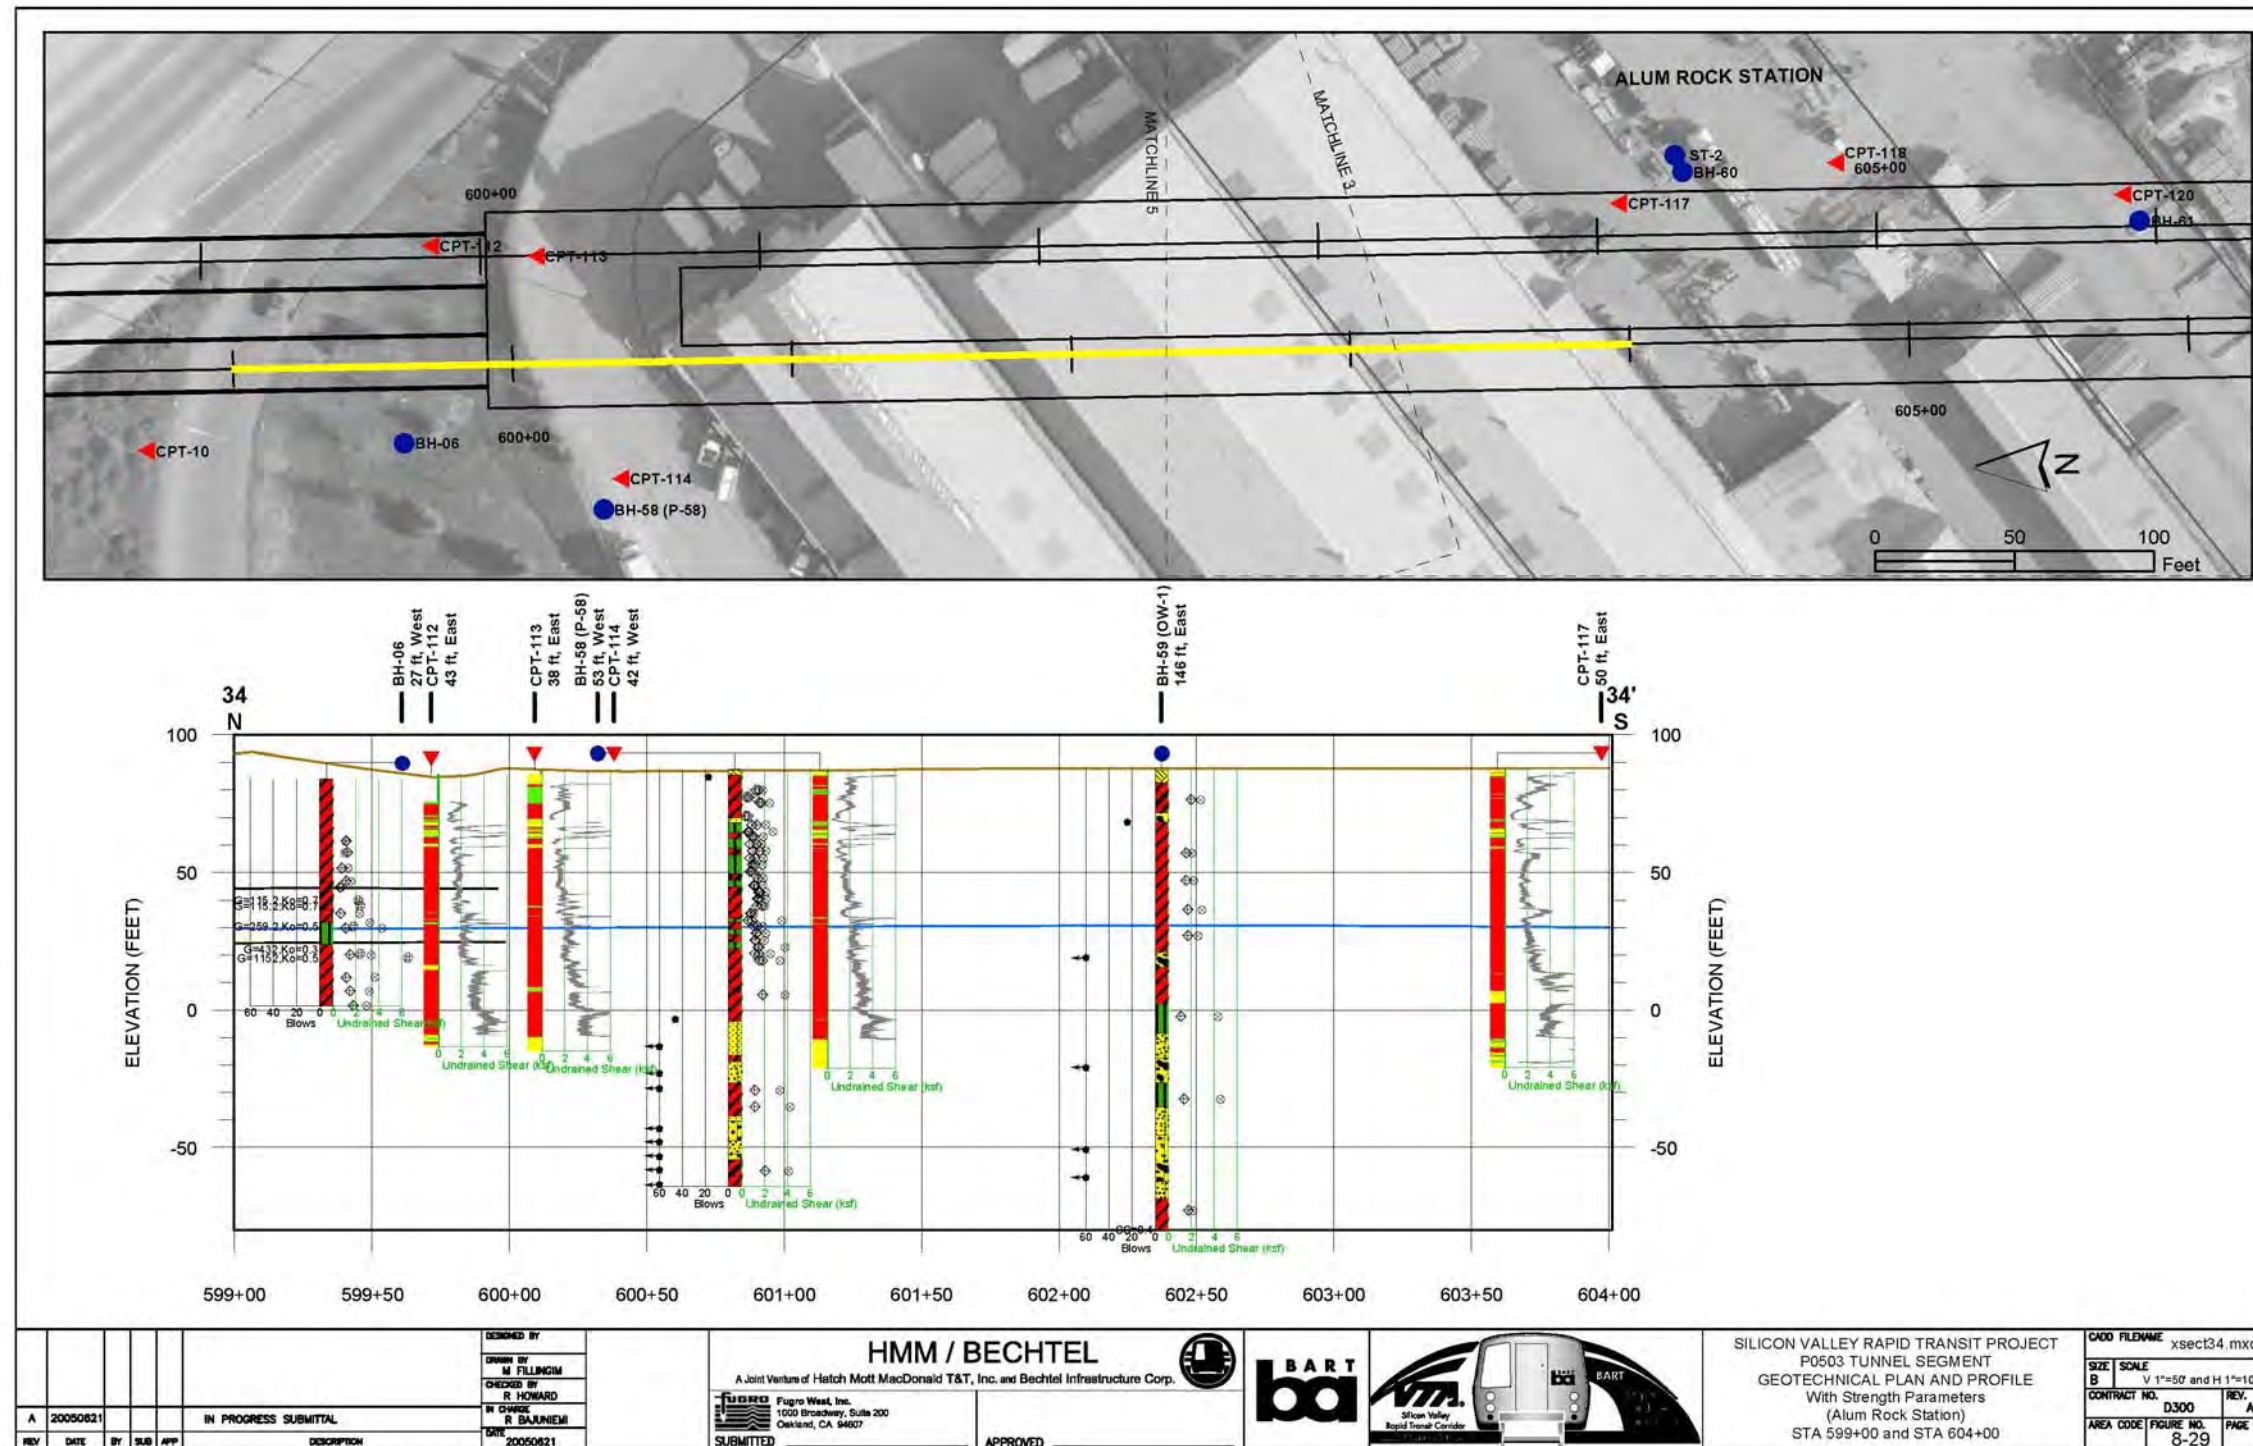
Geotechnical Plan and Profile with Strength Parameters: 599+00 to 604+00.
